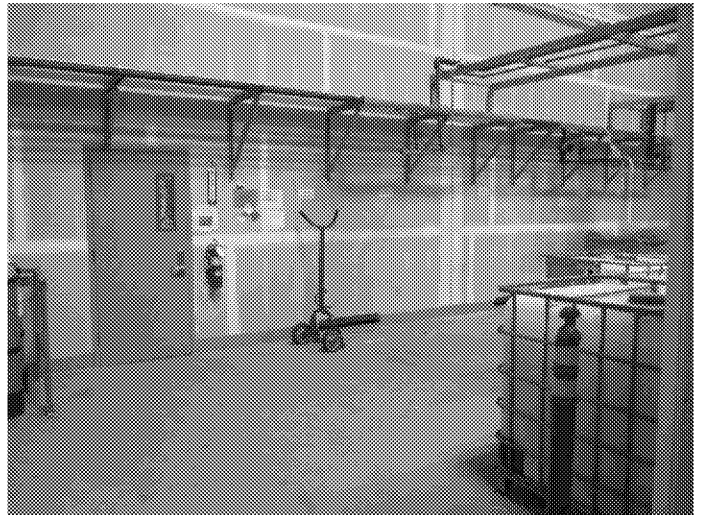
PLAT Room – North End; Visible Residues, Depositions, Staining/Discoloration in area. Entry to WWAN Room on left side of photo.
